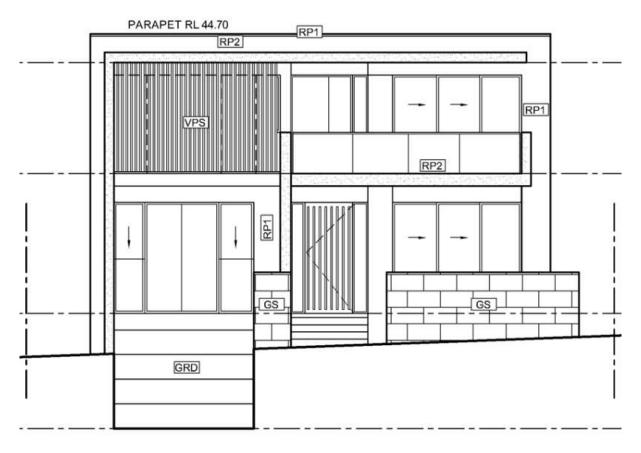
Front elevation of the proposed dwelling house (source: N Lycenko Architect, dated May 2020)
